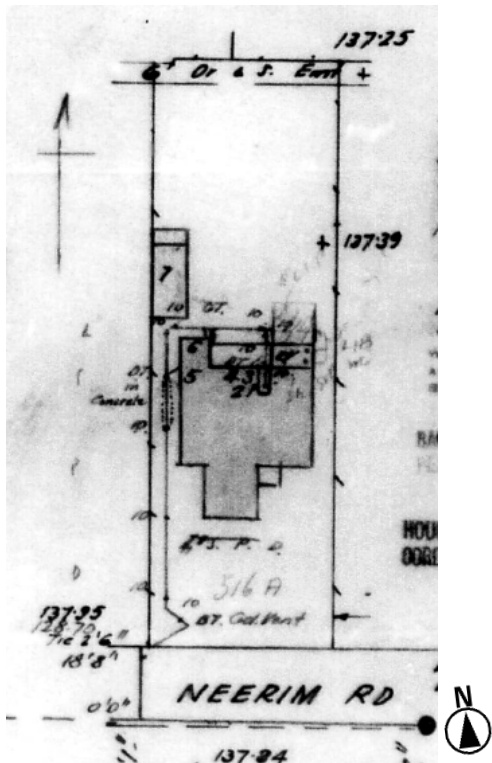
Drainage plan for 516A Neerim Road (lot 4), dated February 1941 (Source: SEW, Drainage Plan No. 223031)
